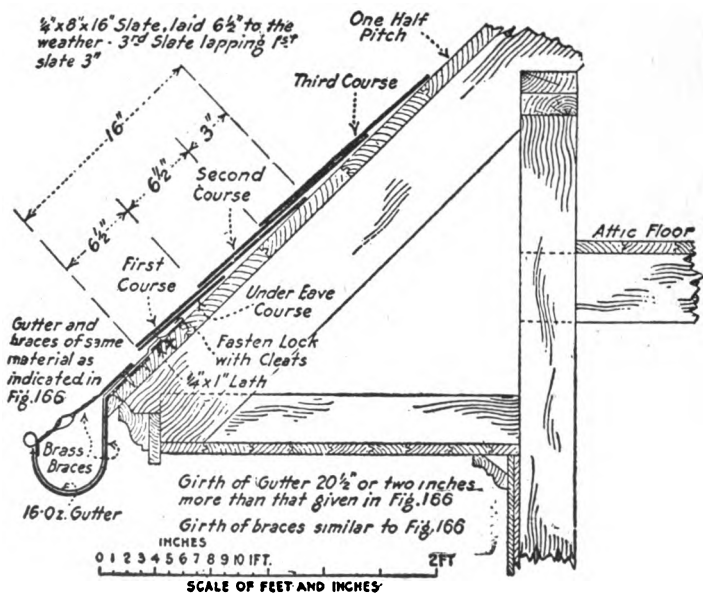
Detailed Section of Copper Gutter Under Slate or Tile Roof
